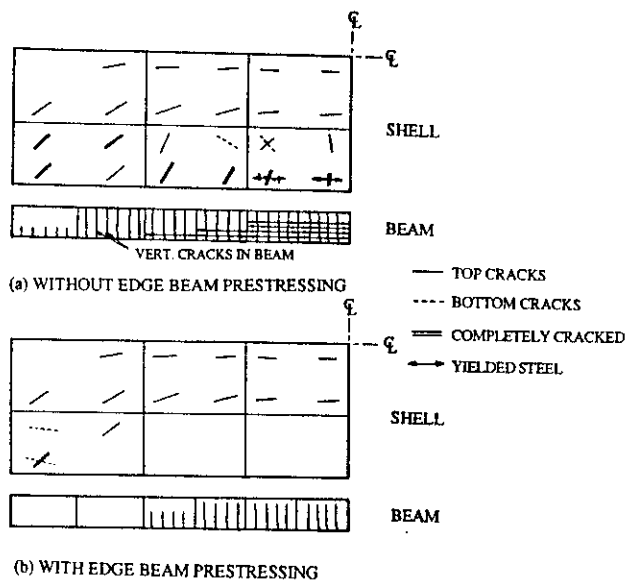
Ex. 1. Crack Patterns for Shell and Beams With and Without Edge Beam Prestressing.
